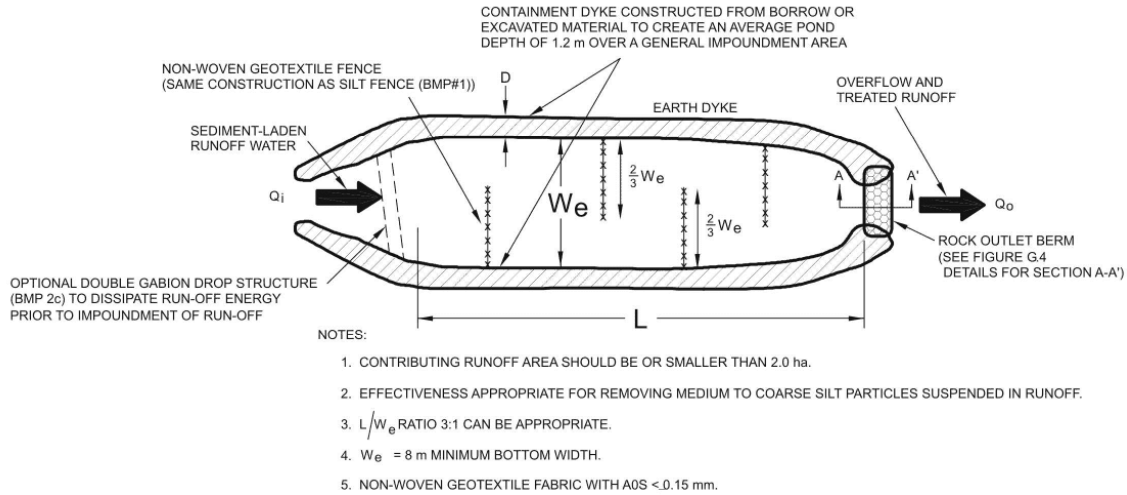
e: Type II Containment Structure (Sediment Trap Plan)
